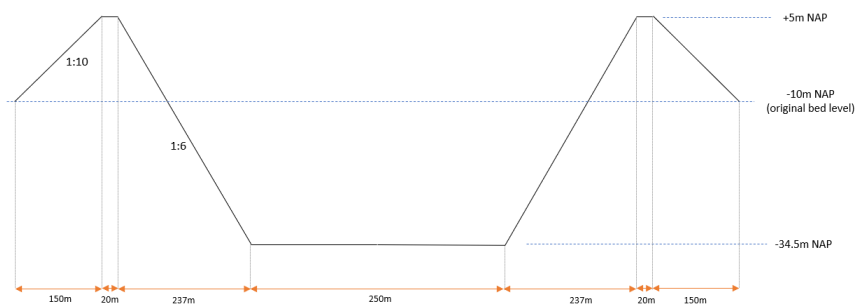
Initial design of the cross-section of the building pit and its dimensions [Image NTS]
